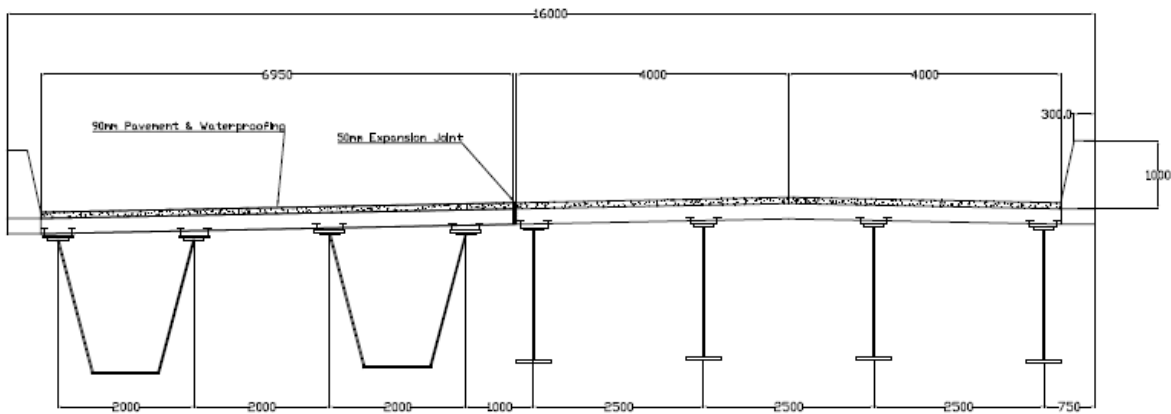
Cross Section of the widened bridge (Dimensions are in mm)
